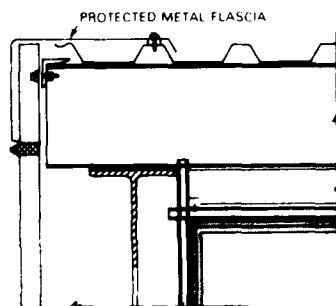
Detail showing metal siding panel bolted to roof panel and roof beam (typical).
